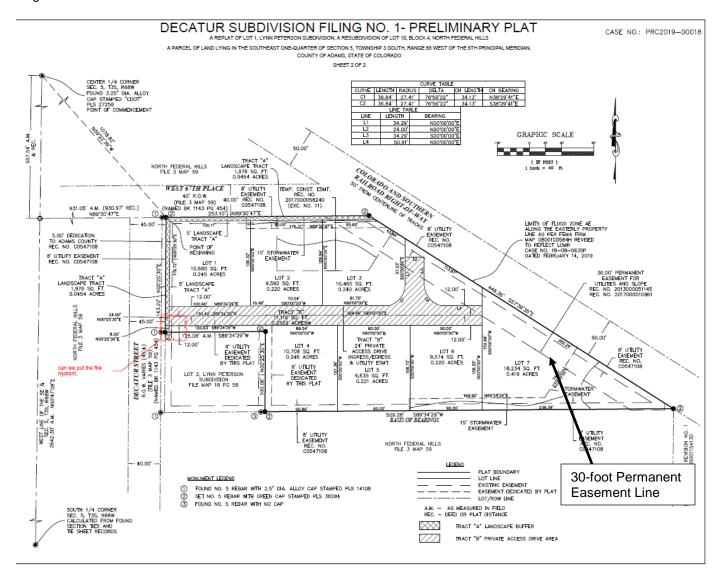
Decatur Subdivision Filing No. 1 Development Site Layout
